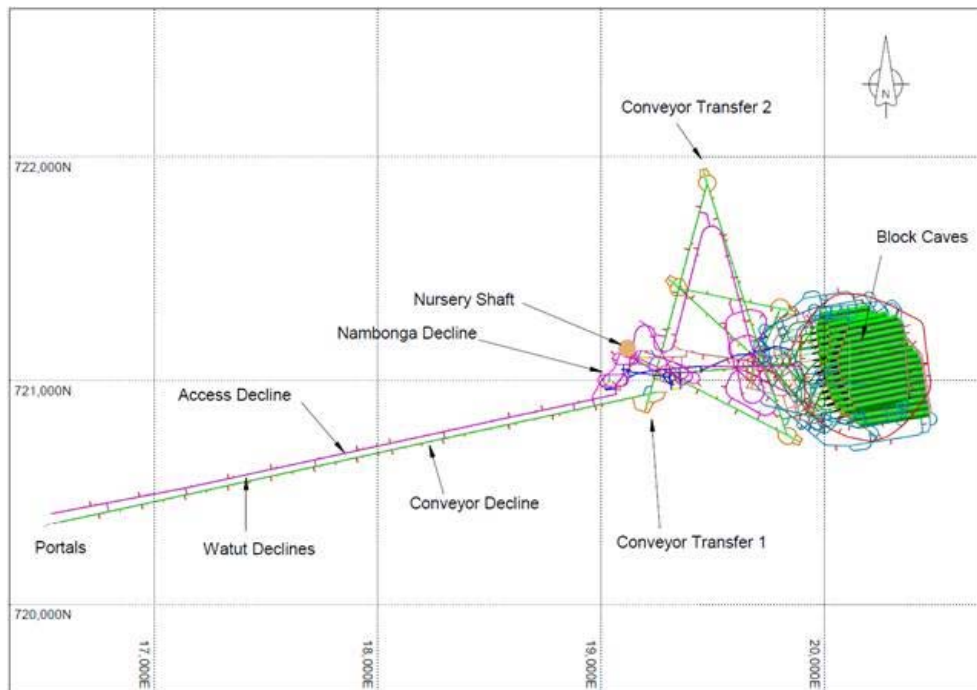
and Figure 16-8 are simplified figures showing the planned mine layout.
